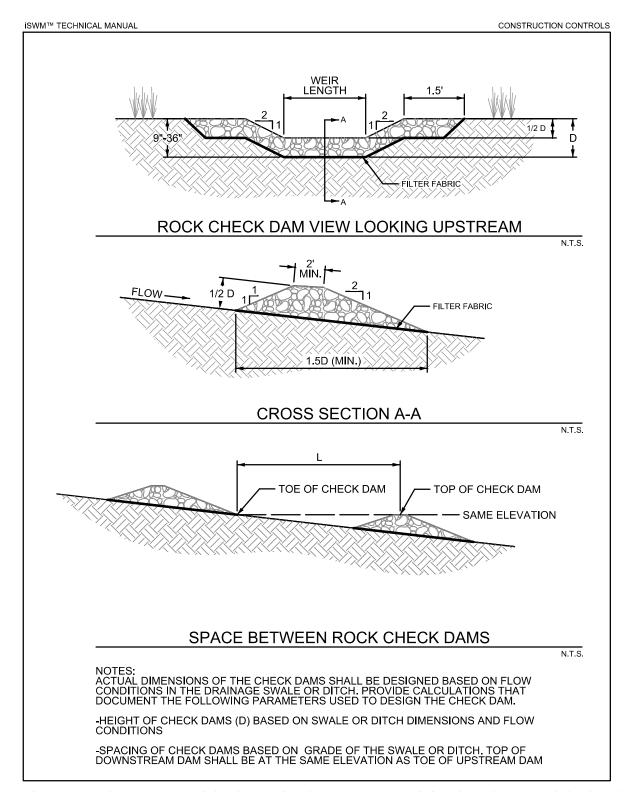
STANDARD CONSTRUCTION DETAIL - ROCK CHECK DAMS (1 OF 2)
